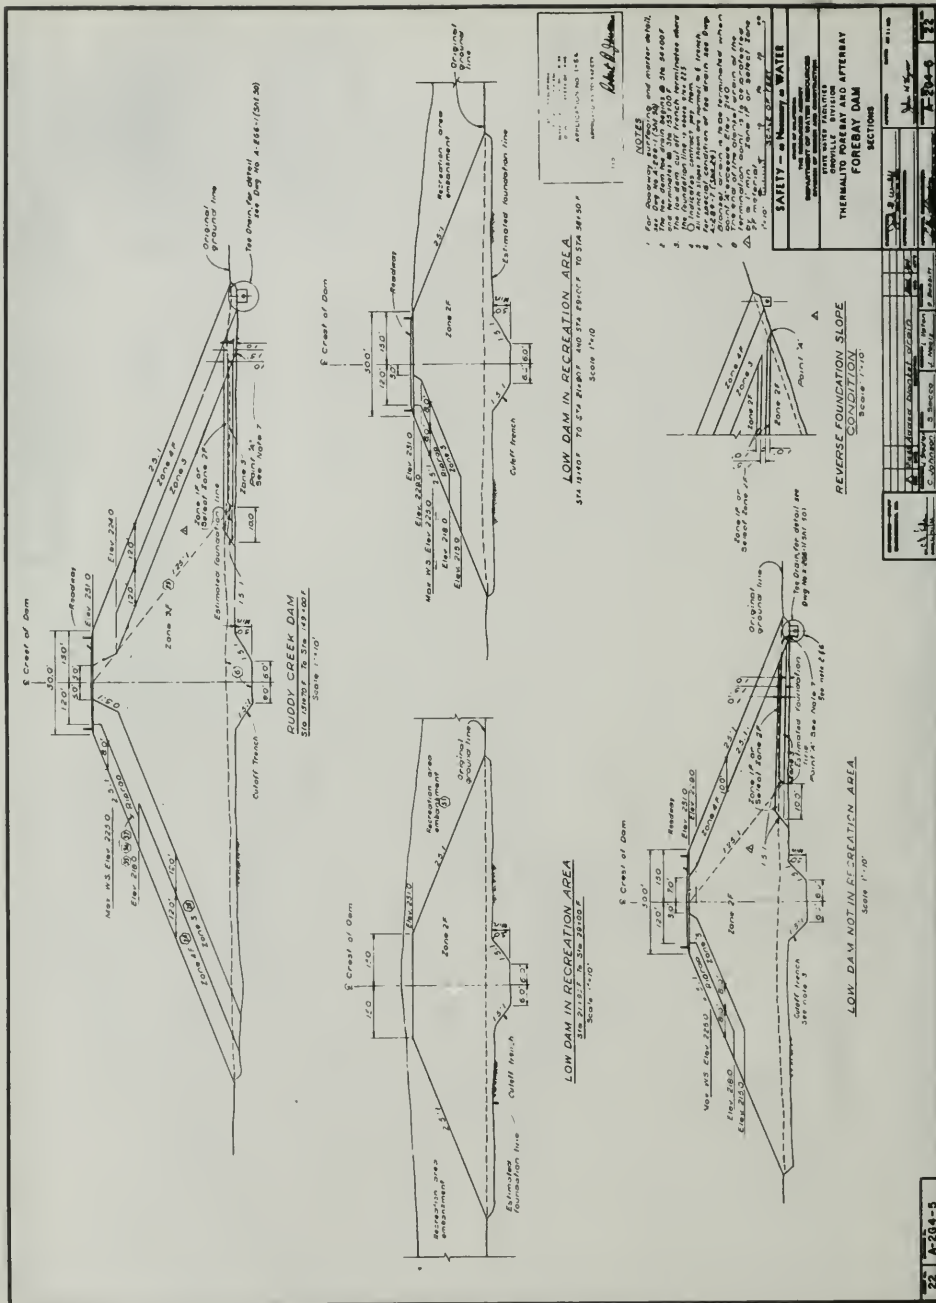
Forebay—Ruddy Creek and Low Dams Sections
